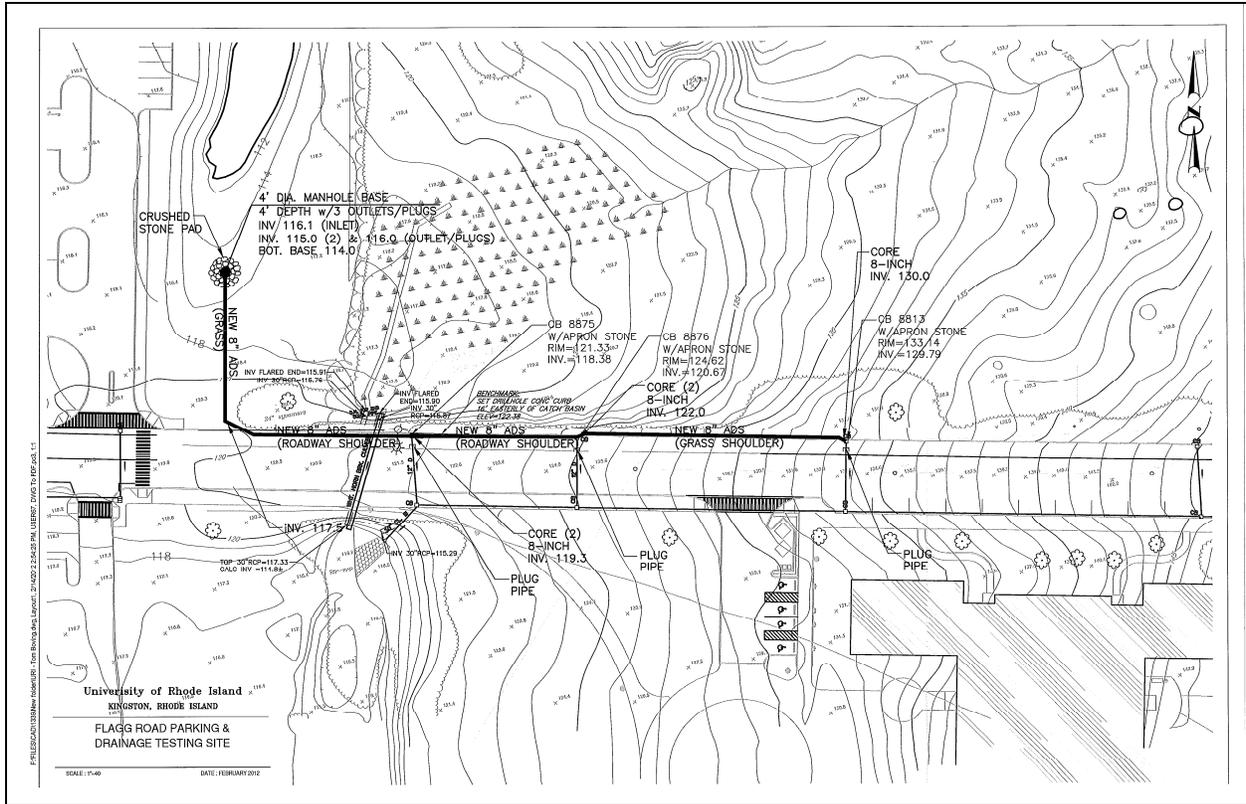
Schematic of the RI STD stormwater management and treatment demonstration facility on the URI campus in Kingston, RI. A pipe connection was constructed that connects our test site with the Flag Road drainage system. Stormwater runoff can now be diverted to a 4' manhole base located in a detention pond east of the Flag Road parking lot.
